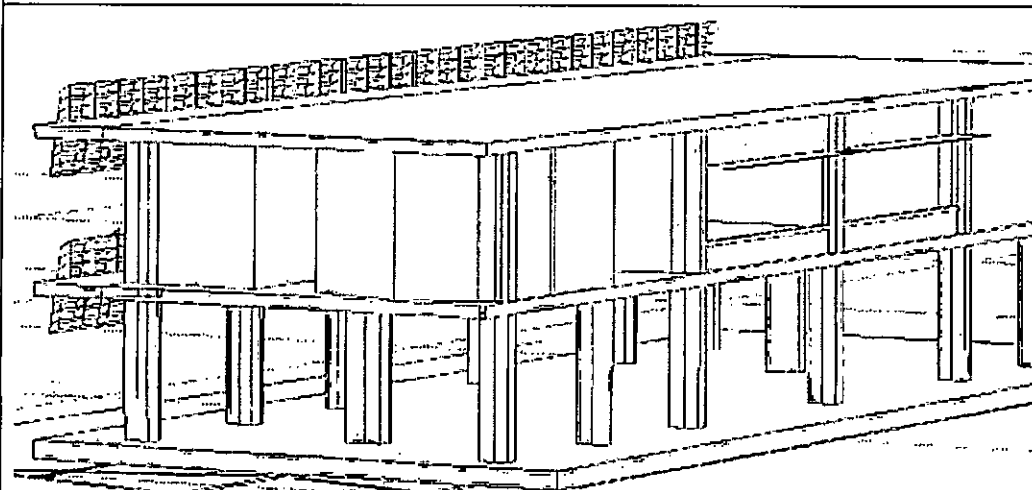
(b): Case 18: light shelf at 2.5 m (south opening)
